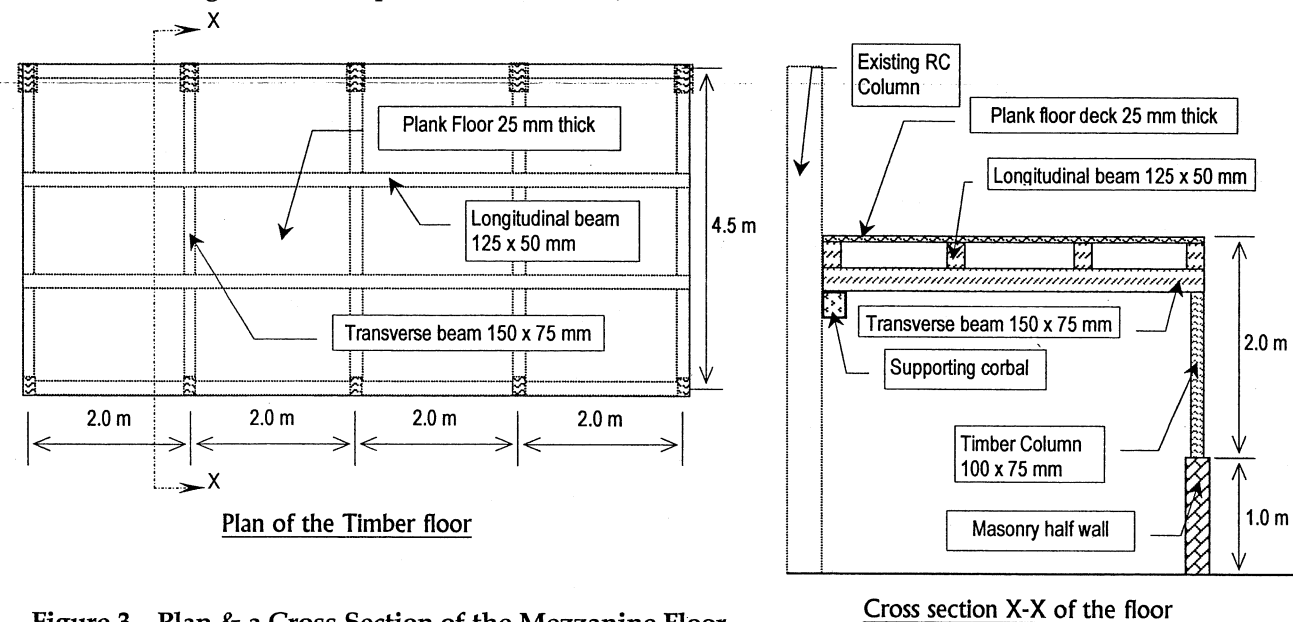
Plan &amp; a Cross Section of the Mezzanine Floor
